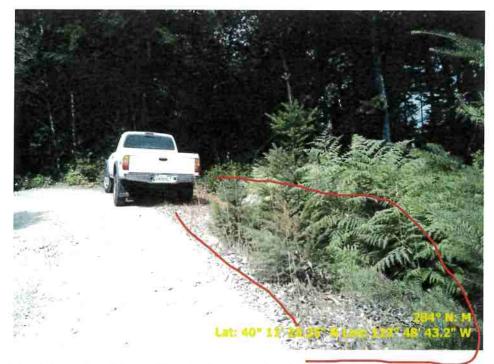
Photo of Road Point 112 showing where concentrated road runoff crosses the road. The fix is to install a culvert or a rocked rolling dip.
